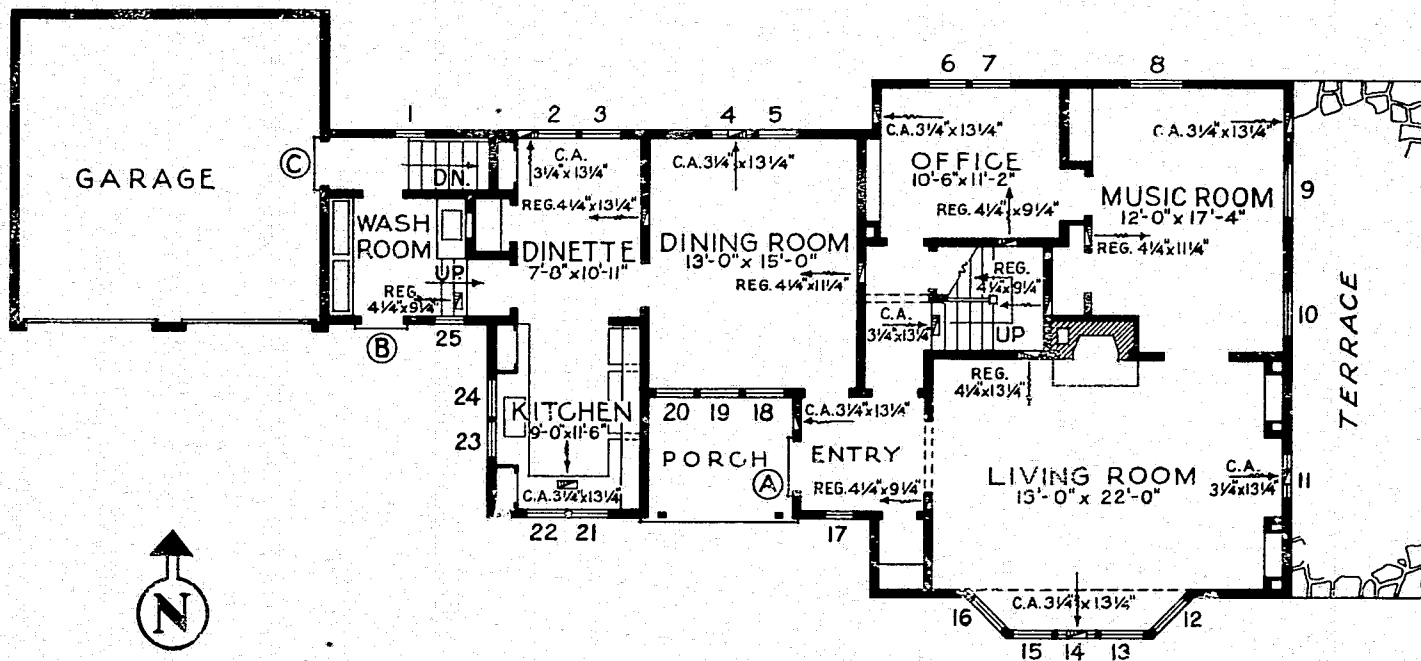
First-floor plan of house No. 8-R, showing the location of warm-air registers and cold-air returns.
